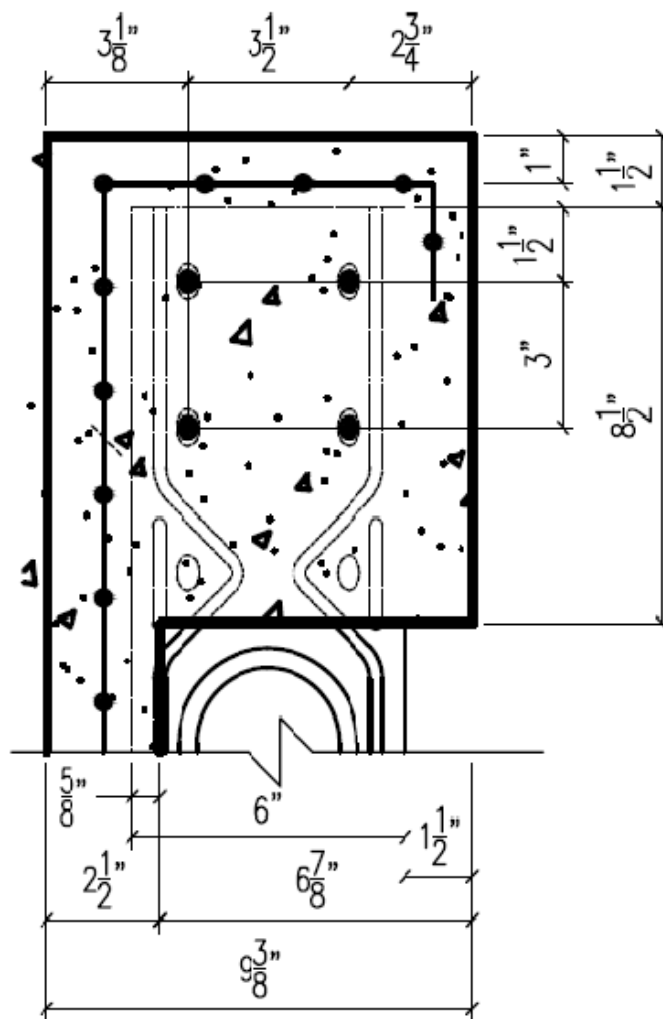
Typical beam details for final wall design (Karimi, 2016)
